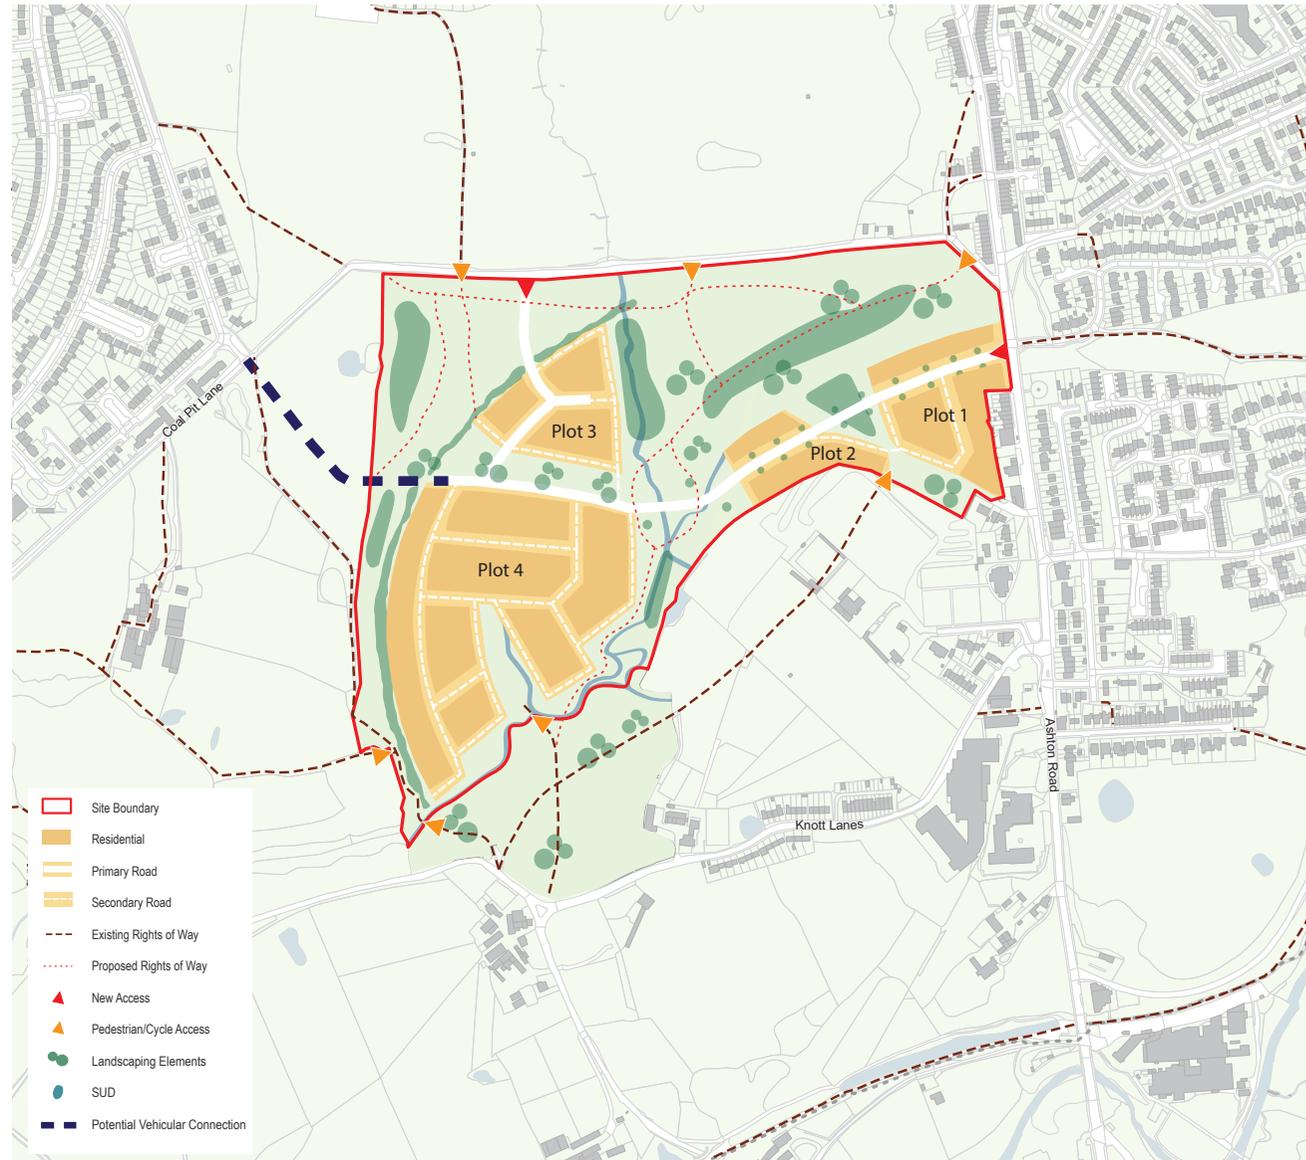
Ashton Road (Coal Pit Lane) conceptual masterplan
